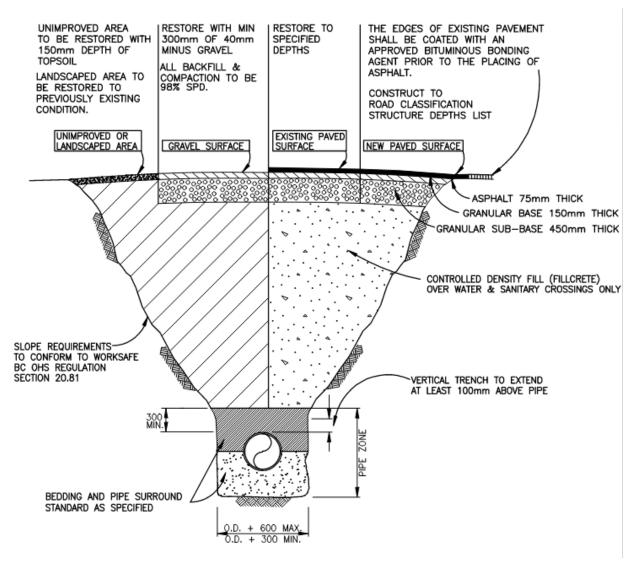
Typical Trench Detail for Chilton Subdivision Sewer Installation
